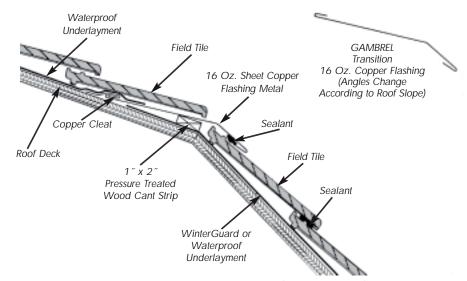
Flashing at High Slope to Low Slope (for Interlocking Tile)
